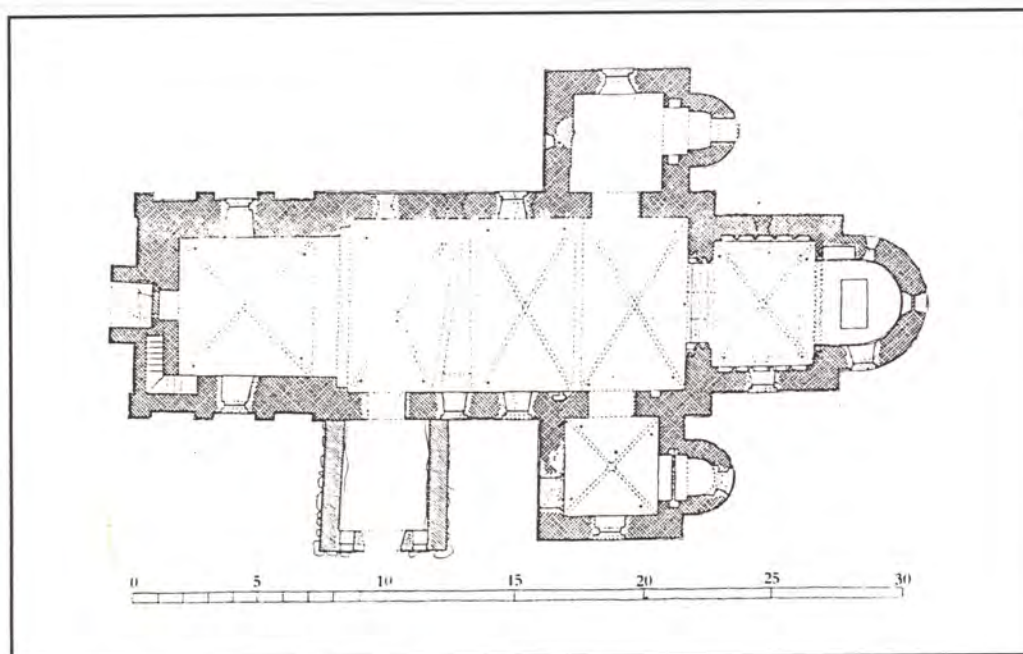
The ground plan of the Benedictine monastery church at Veng, Denmark, showing the projecting apsidal-ended side-buildings (from *Danmarks Kirker*, Århus, Fig. 8).
